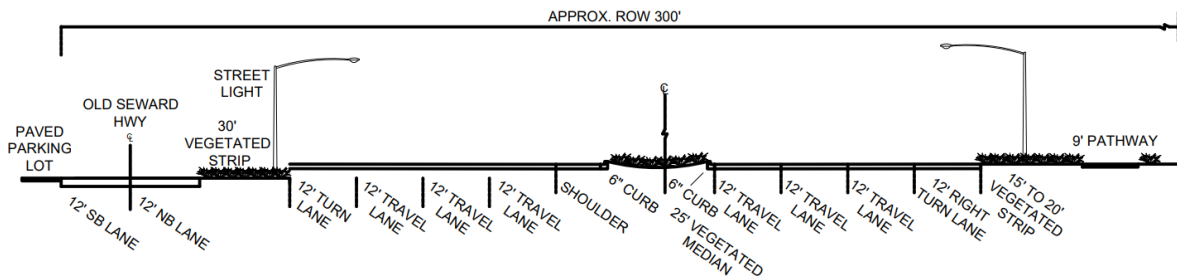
Seward Highway between 36th Avenue and Benson Boulevard
